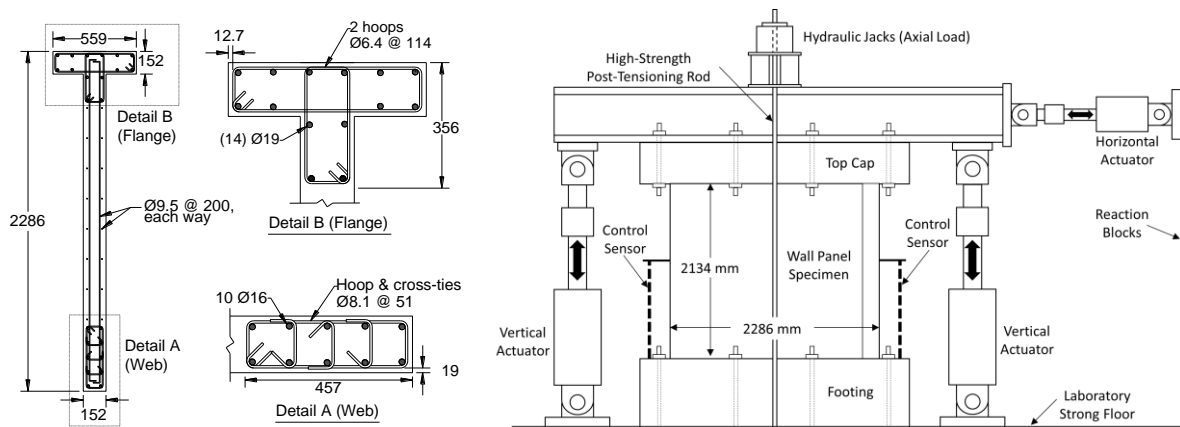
Specimen WP4: (a) Cross-section; (b) Test setup.
